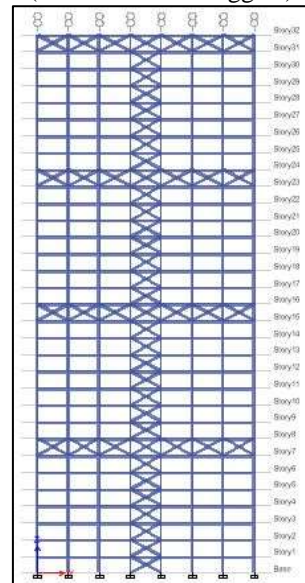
Sectional Elevation of Building Model 5 (Braced core wall with X Outriggers)
